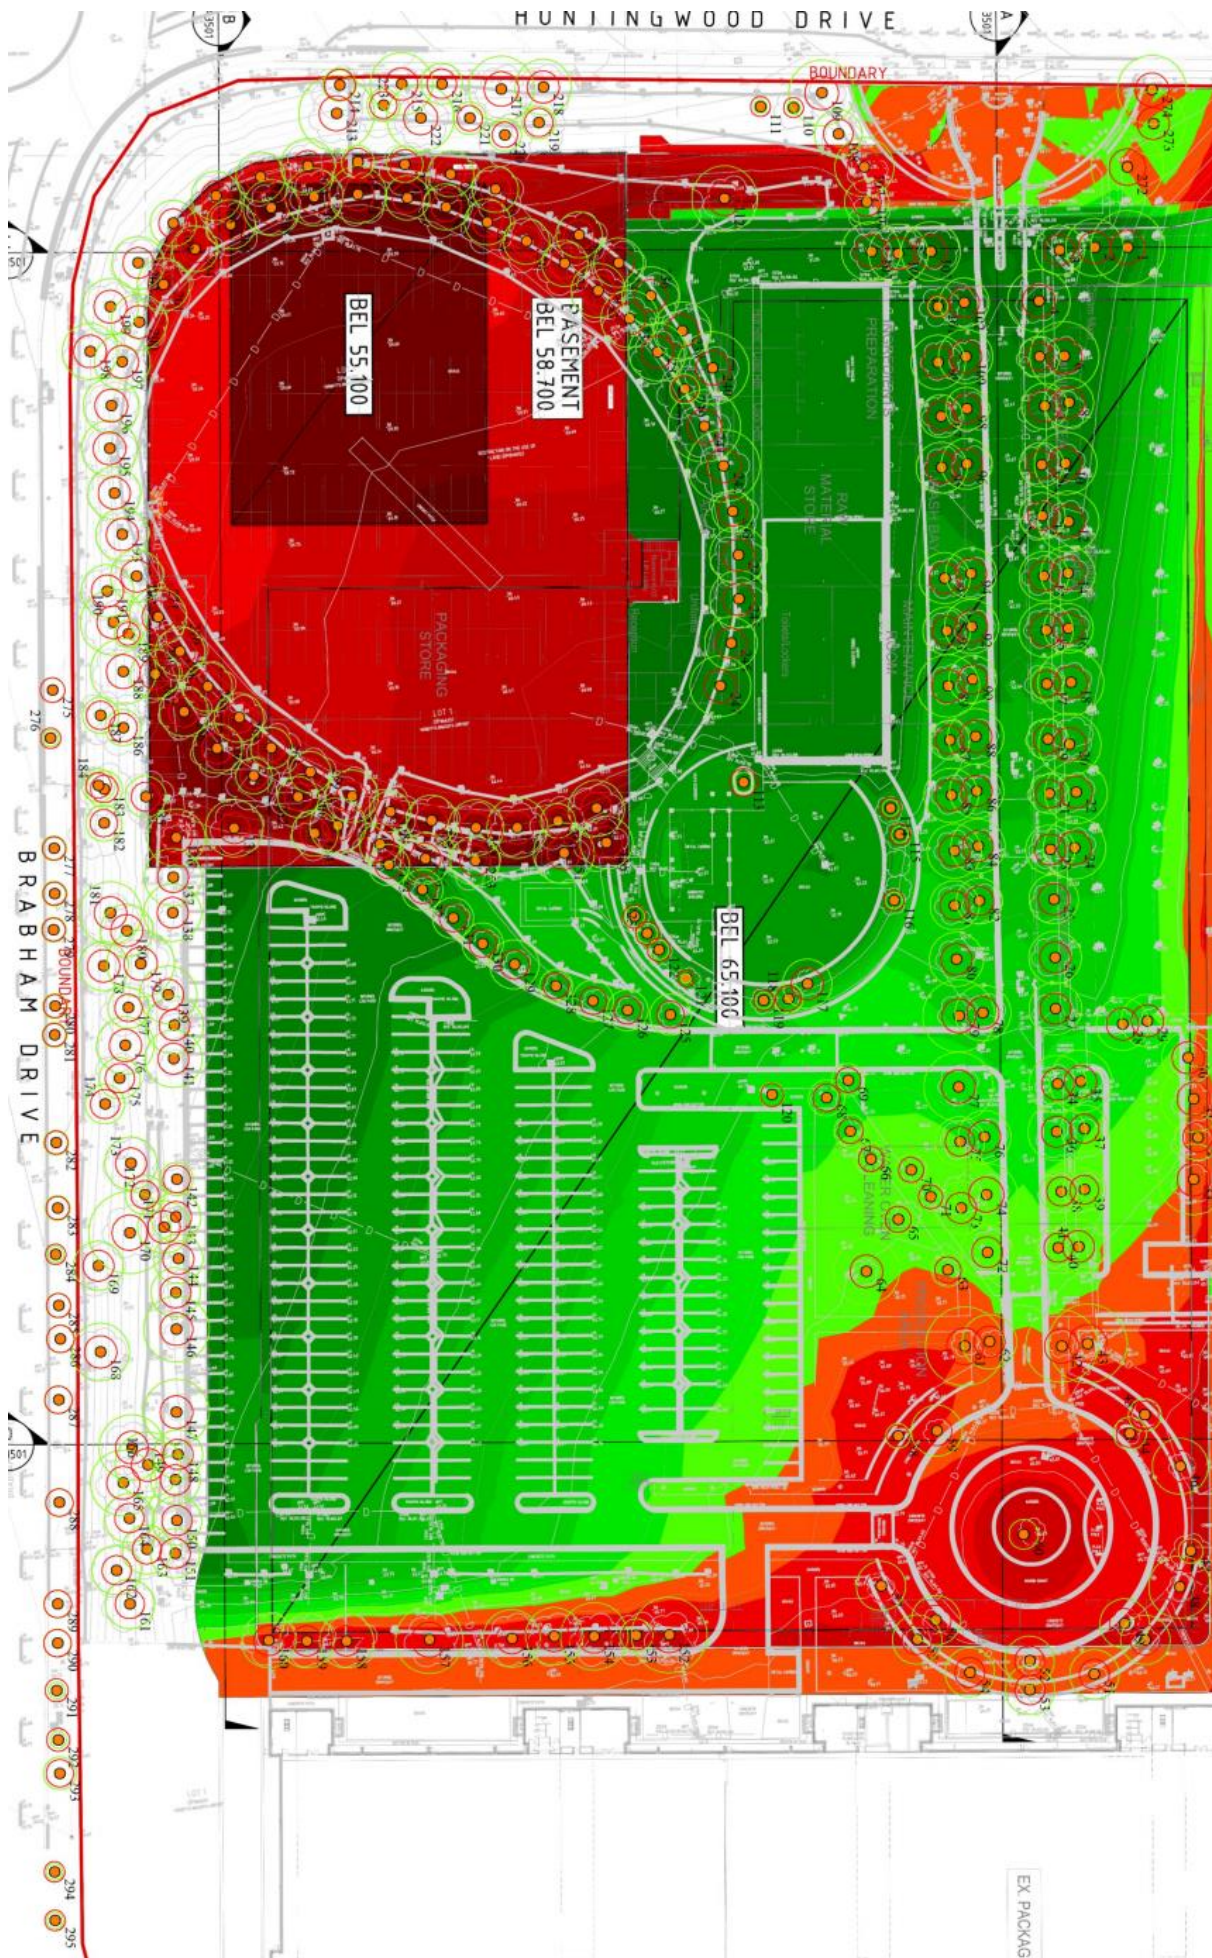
Tree locations overlaid onto the cut & fill plan showing the main area of construction in the N/W corner of the site.
